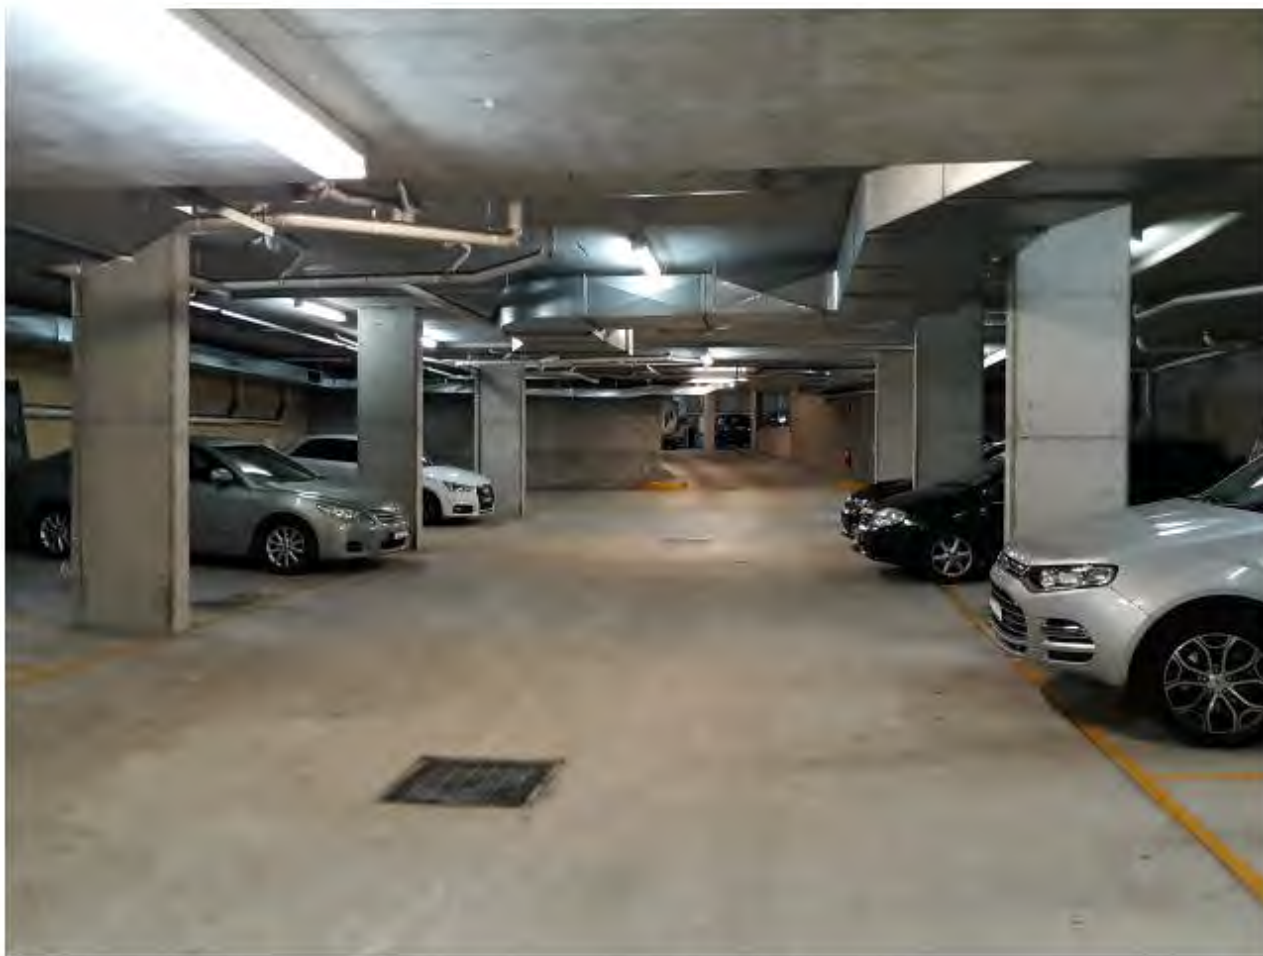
Interior of the brick and concrete garage beneath buildings 2 and 3. (Source: BHHH, 2018)
